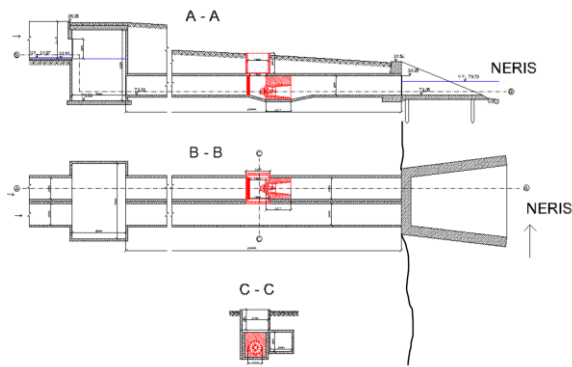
Preliminary layout of installing a submersible, modular turbine into an underground concrete chamber. Vilnius WWTP (V2). Receiving water body – the Neris River
